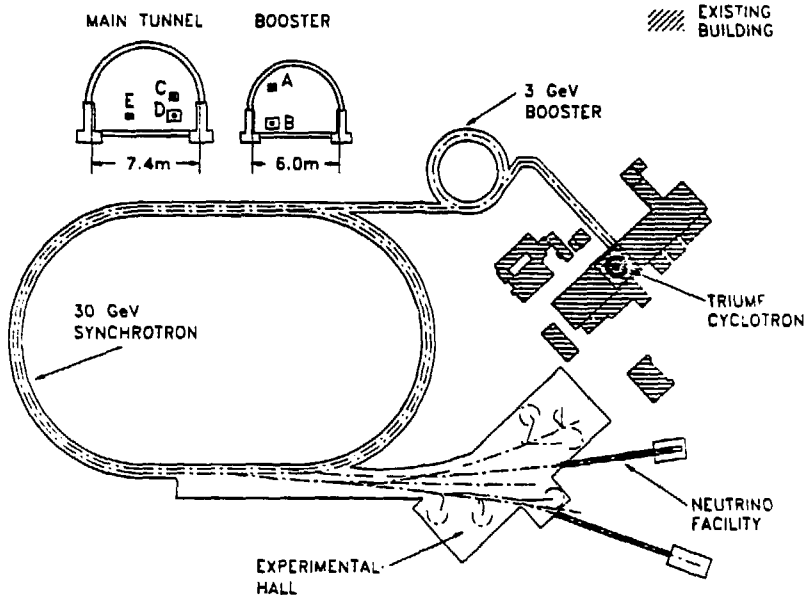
Proposed layout of the accelerators and cross sections through the tunnels.
